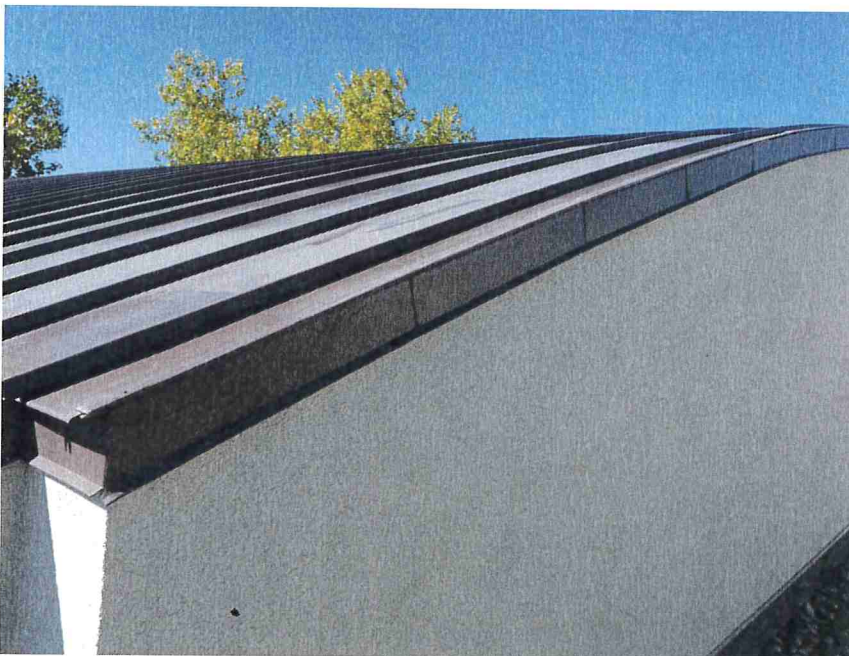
View of the flashing along the rake of the standing seam metal roof.
